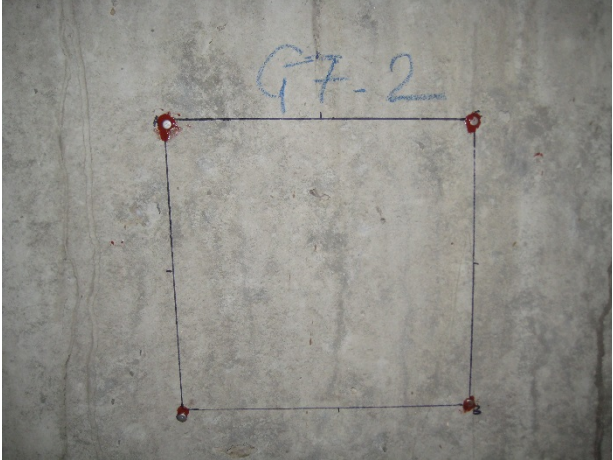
Close-up photo of G7-2 corresponding sealed humidity probe drilled holes, showing minimal cracking
